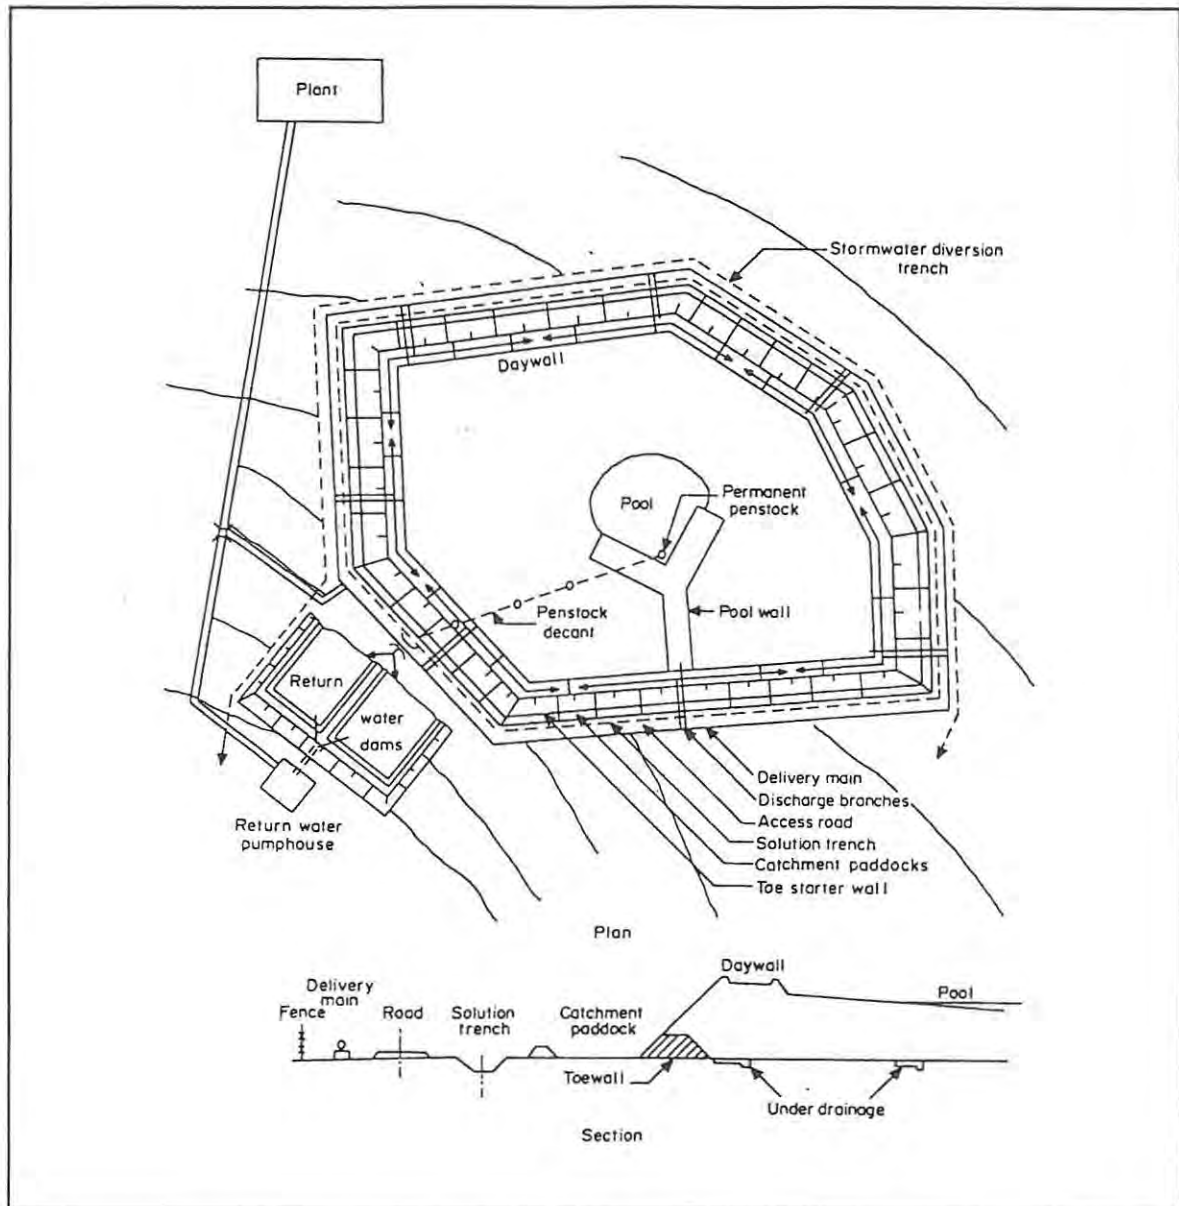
Typical layout of a mine dump (From Funke, 1990).
